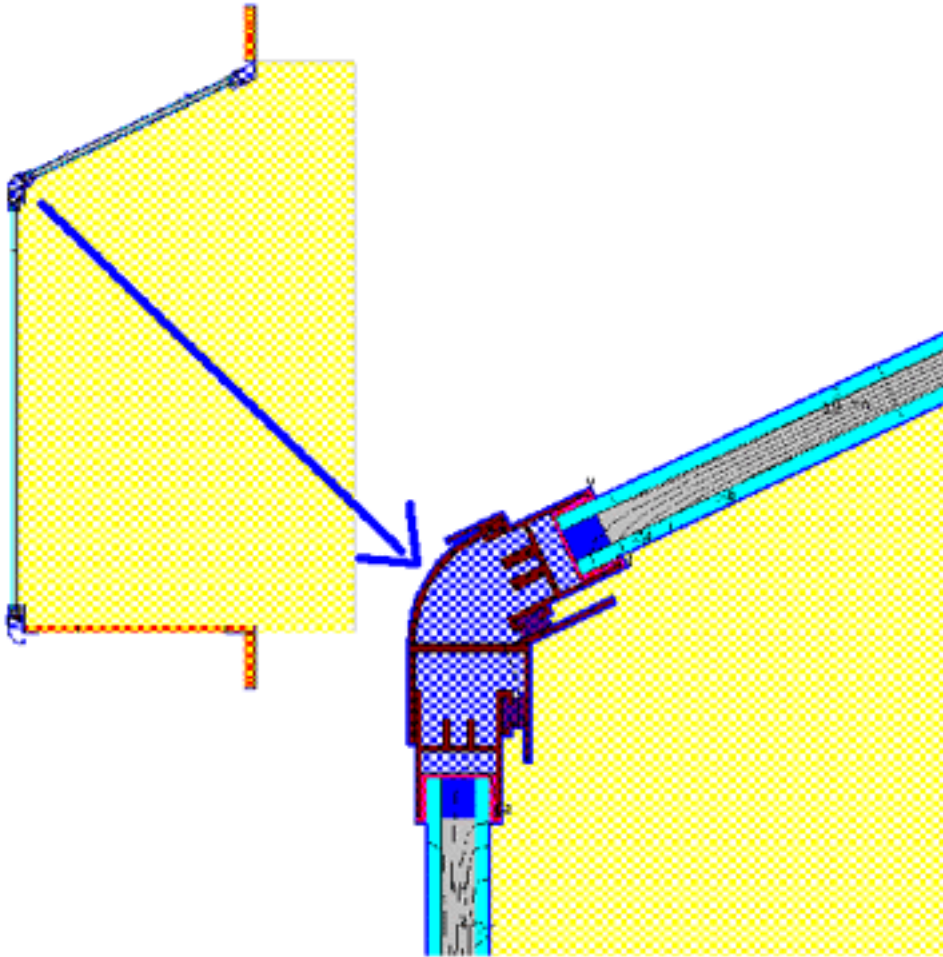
(Upper Left) Greenhouse window vertical cross-section defined with THERM 2.0. Shaded areas define a radiation enclosure; radiation view factors for all elements on the boundary are calculated. (Lower Right) Detail of the greenhouse window cross-section shown after heat transfer analysis; isotherms show constant temperature contours.
